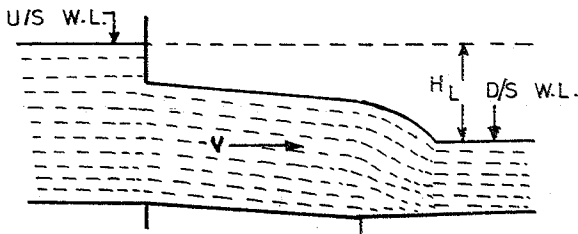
Box or pipe culvert running full even when the outlet is not submerged.
